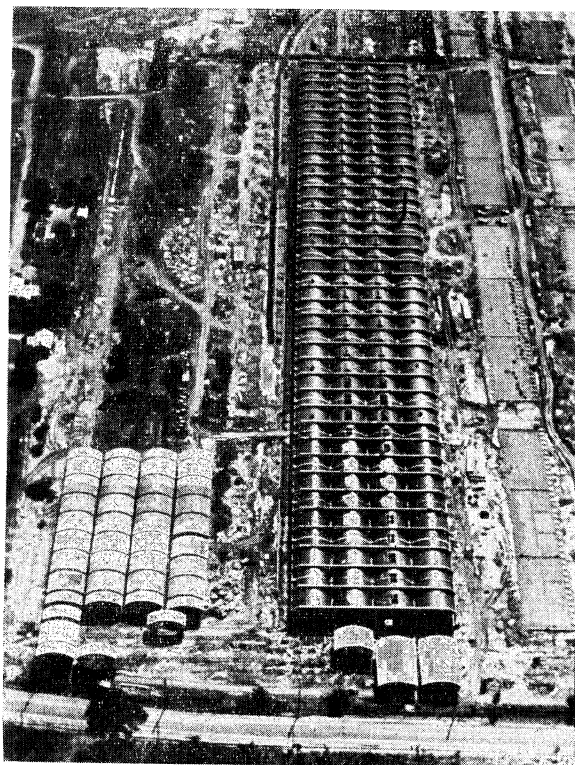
1562 ft long multiple span concrete shell warehouse, built in 34 calendar days (1941). Note the simplicity of the top surface of form travelers
